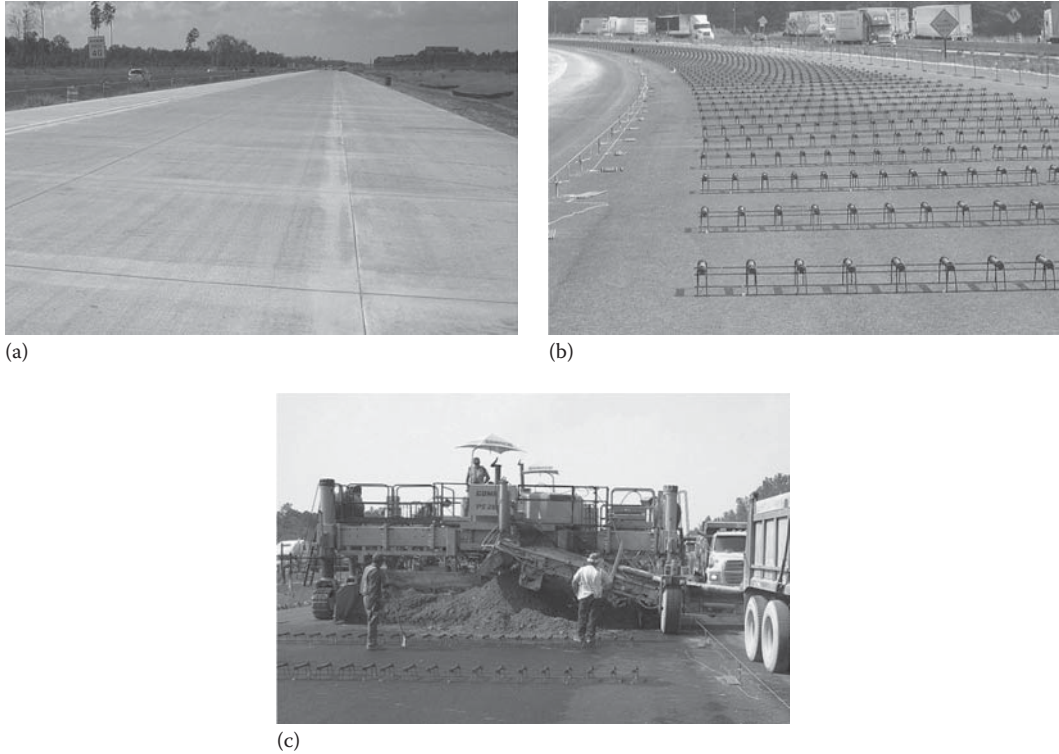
Jointed plain concrete pavements (JPCP) (a) showing transverse and longitudinal joints, (b) JPCP dowel bar and chair assembly set on an asphalt bonded base prior to slipform paving operations, and (c) JPCP under construction with slip form operation.
